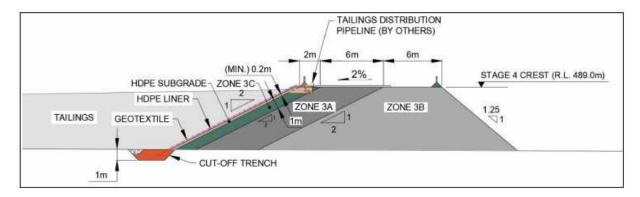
Typical Section IWLTSF Stage 4 Embankment Extension, including Cut-off Trench Configuration (REC, 2025)
